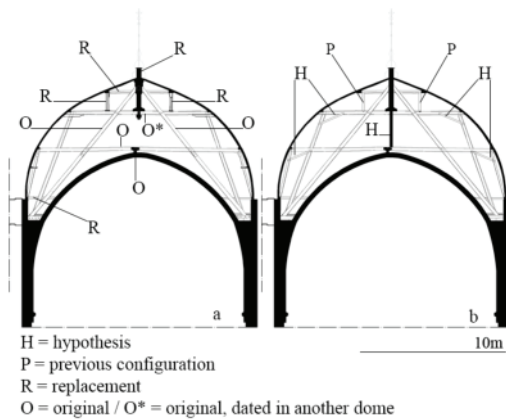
d02. Cross section: a) current state, b) hypothesis on the original layout (drawing: author).
